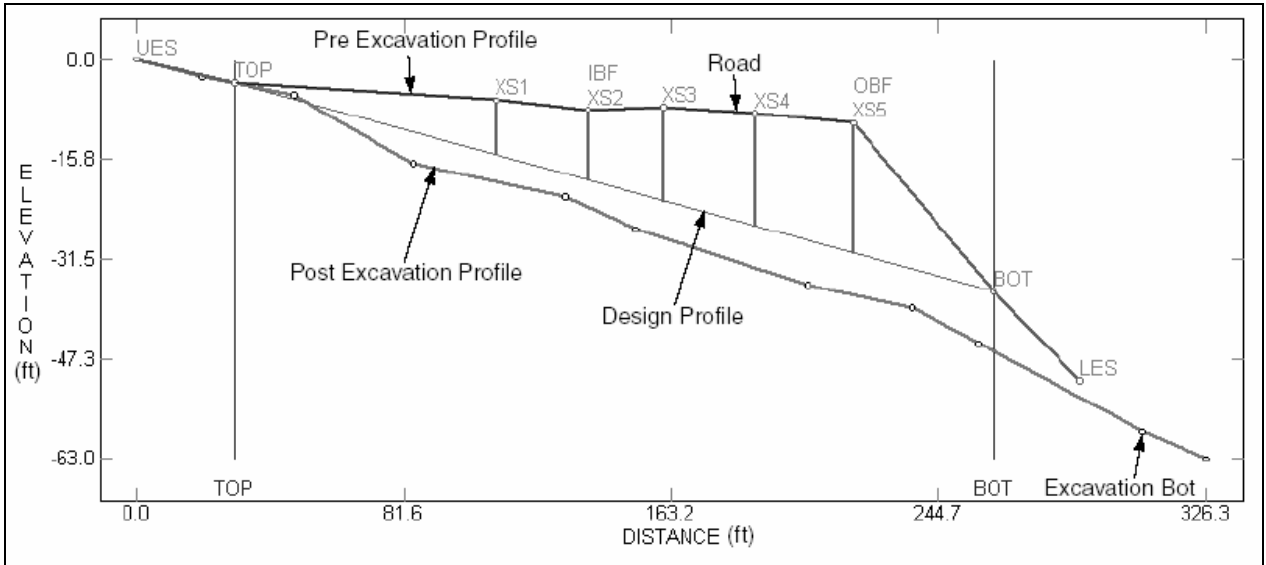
Redwood Creek 1305 Road Site #11 – Stream Crossing Pre & Post Excavation Profiles.
